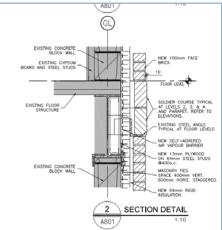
Example of specific wall detail; Reference Architectural Drawings
